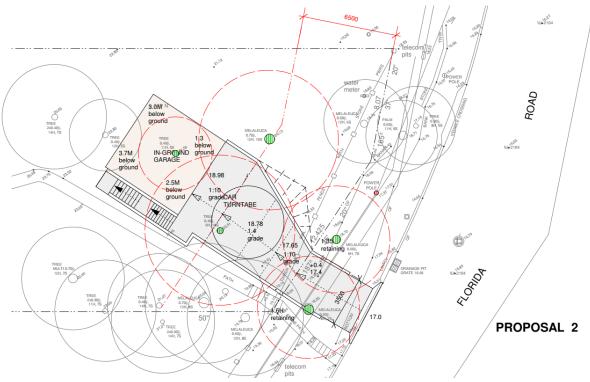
Alternative Florida Road car parking arrangement showing similar impact.
